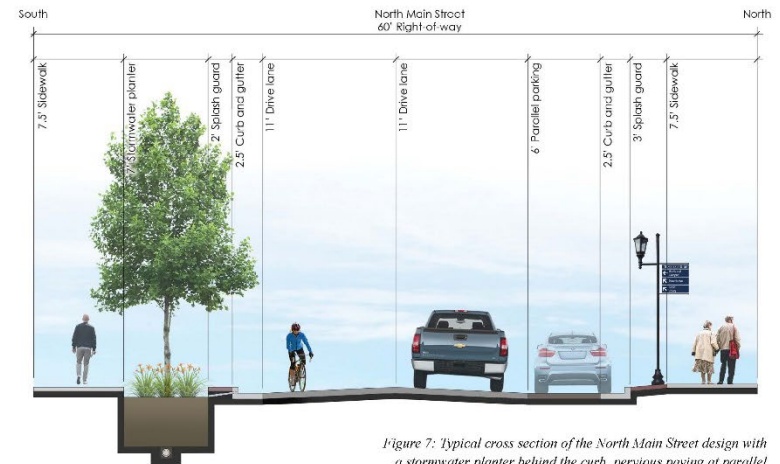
Typical cross section of the North Main Street design with a stormwater planter behind the curb, pervious paving at parallel parking spaces, a pervious paving splash guard behind the curb and historic street lights with directional signage.
